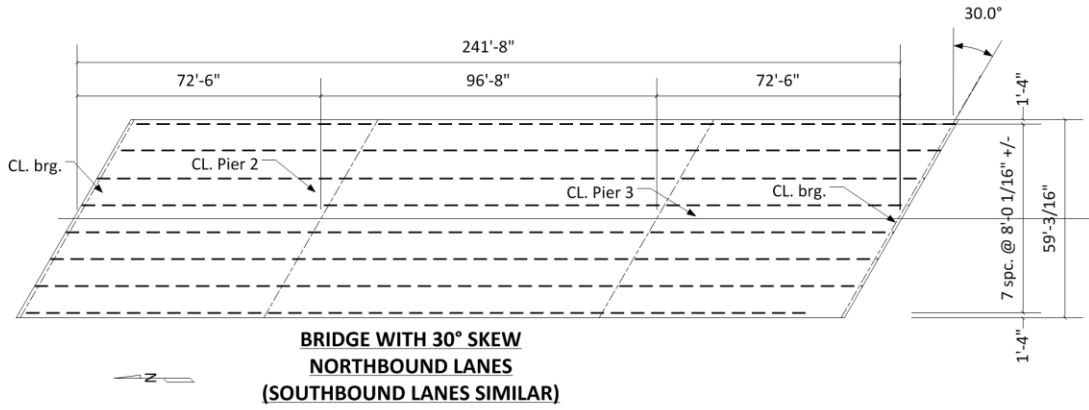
Three Span Bridge - Plans and Elevation (D-17-DJ bridge)
